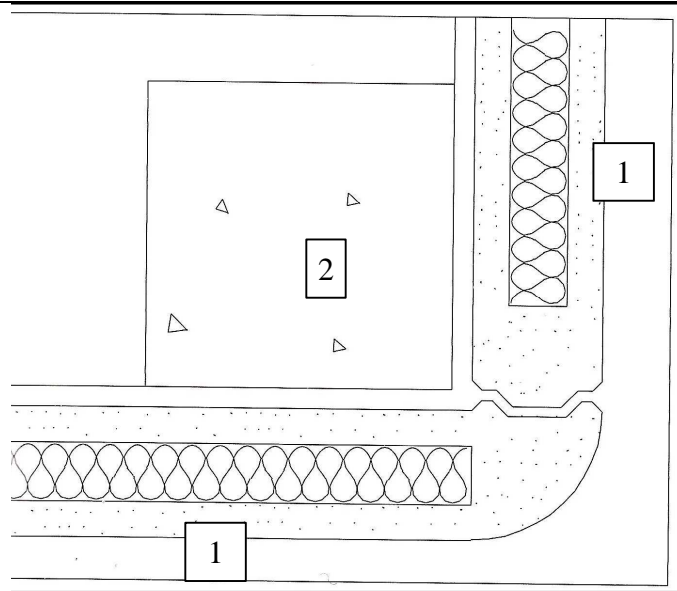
Detail of the corner and of the panel-to-panel joint of a precast concrete wall: 1 - Precast concrete panel with a rigid insulation board between layers; 2 - Concrete column (Watts, 2005)
